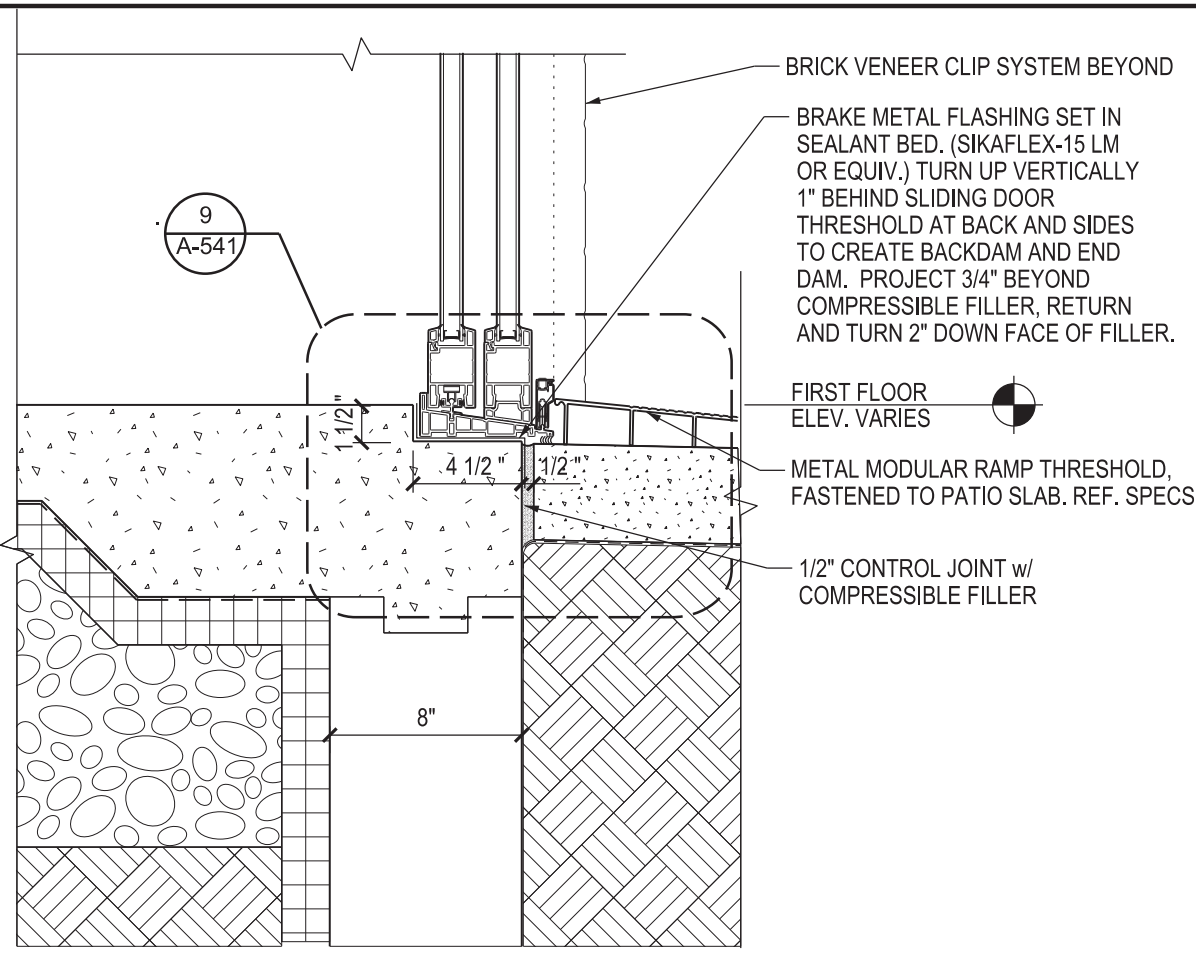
EXHIBIT E - ARCHITECTURAL RENDERINGS - DETAILS
